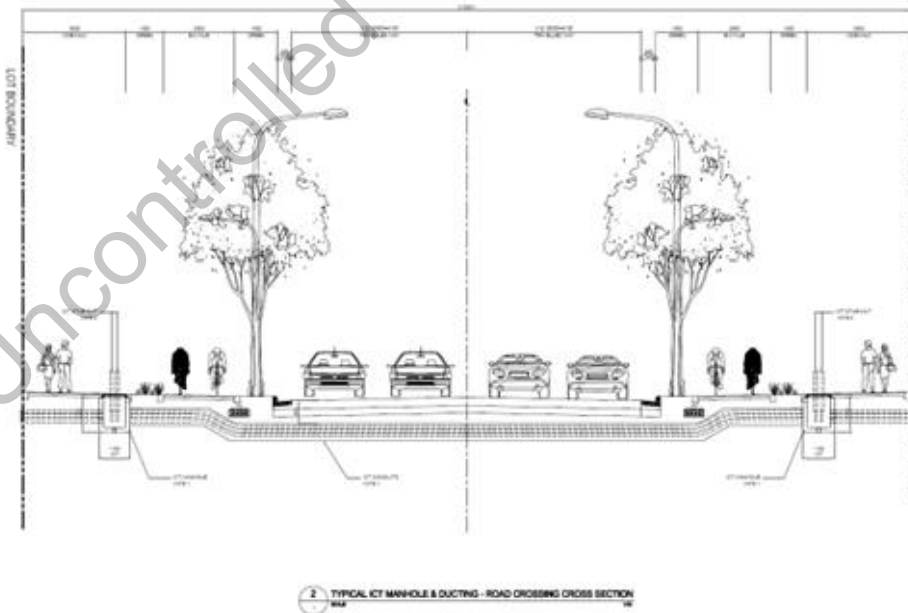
Typical ICT Manhole and Ducting for road crossing
